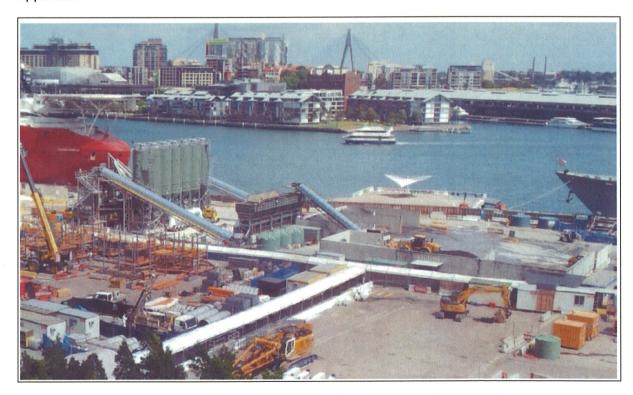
View of the temporary concrete batching plant looking west across Barangaroo South
